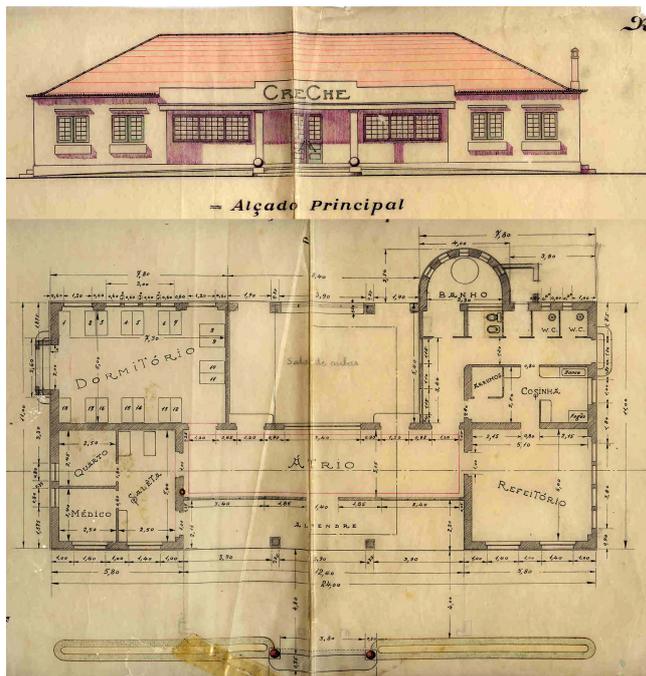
Architectural project of the nursery in Vista Alegre: elevation and plan (Vista Alegre archives)
